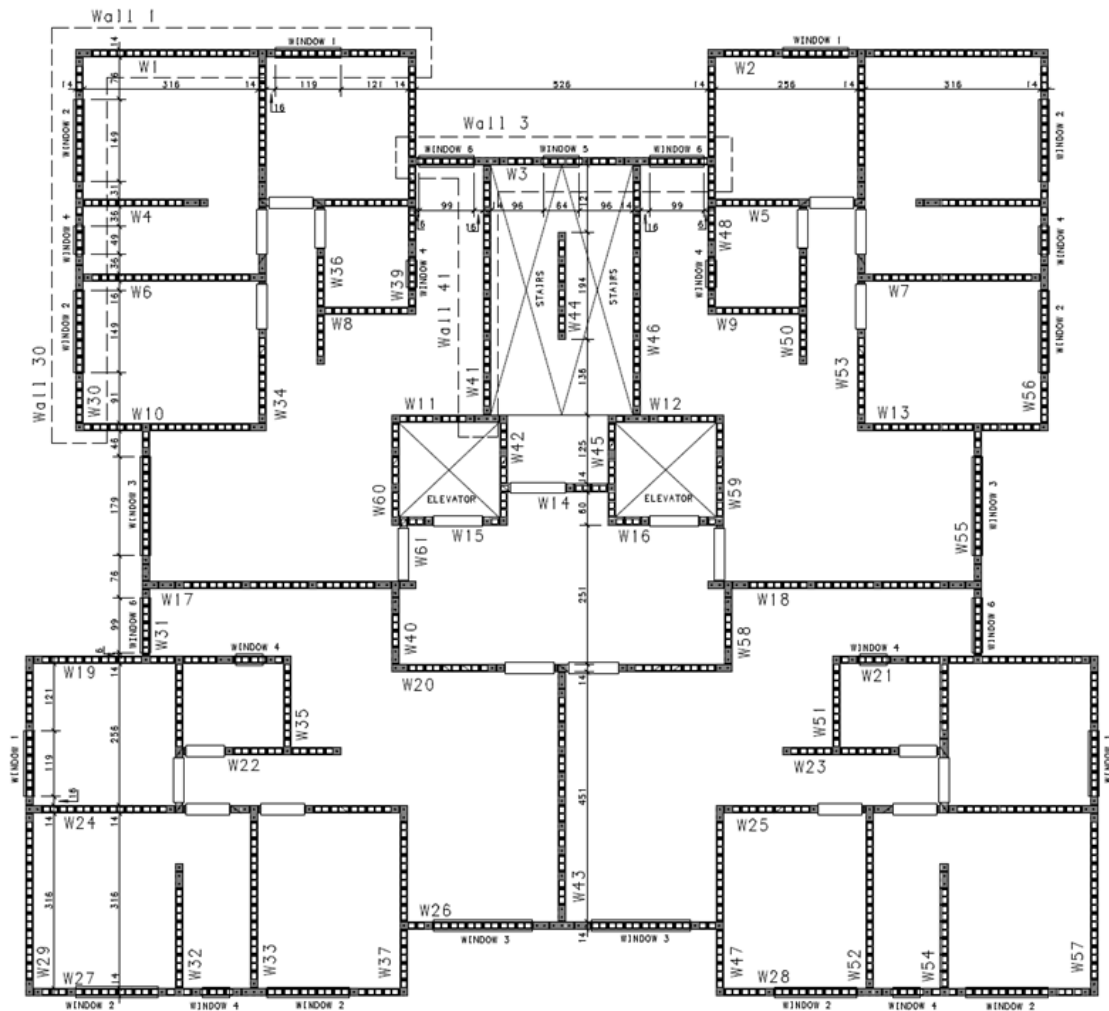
Wall layout, highlighting the walls under study. Adapted: Medeiros [5].
